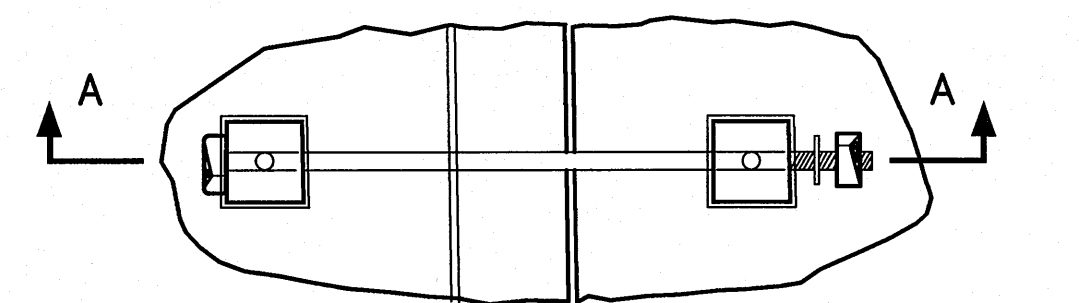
DETAIL OF PIPE UNDERDRAIN / FIELD TILE OUTLET INTO STORM SEWER OR PIPE CULVERT
